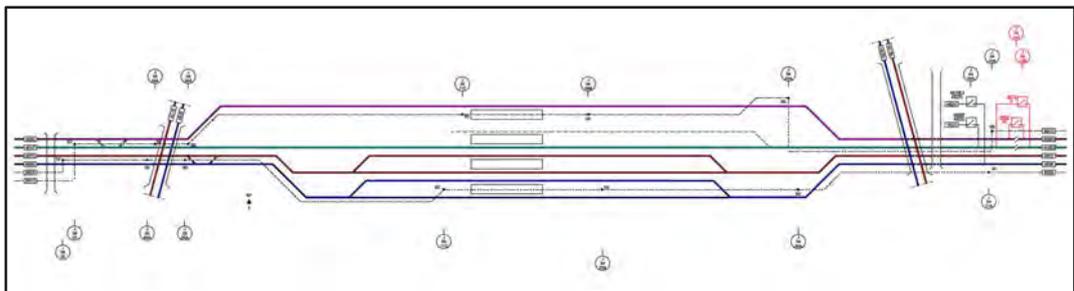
Proposed sectioning update for Relief Lines to final alignment
